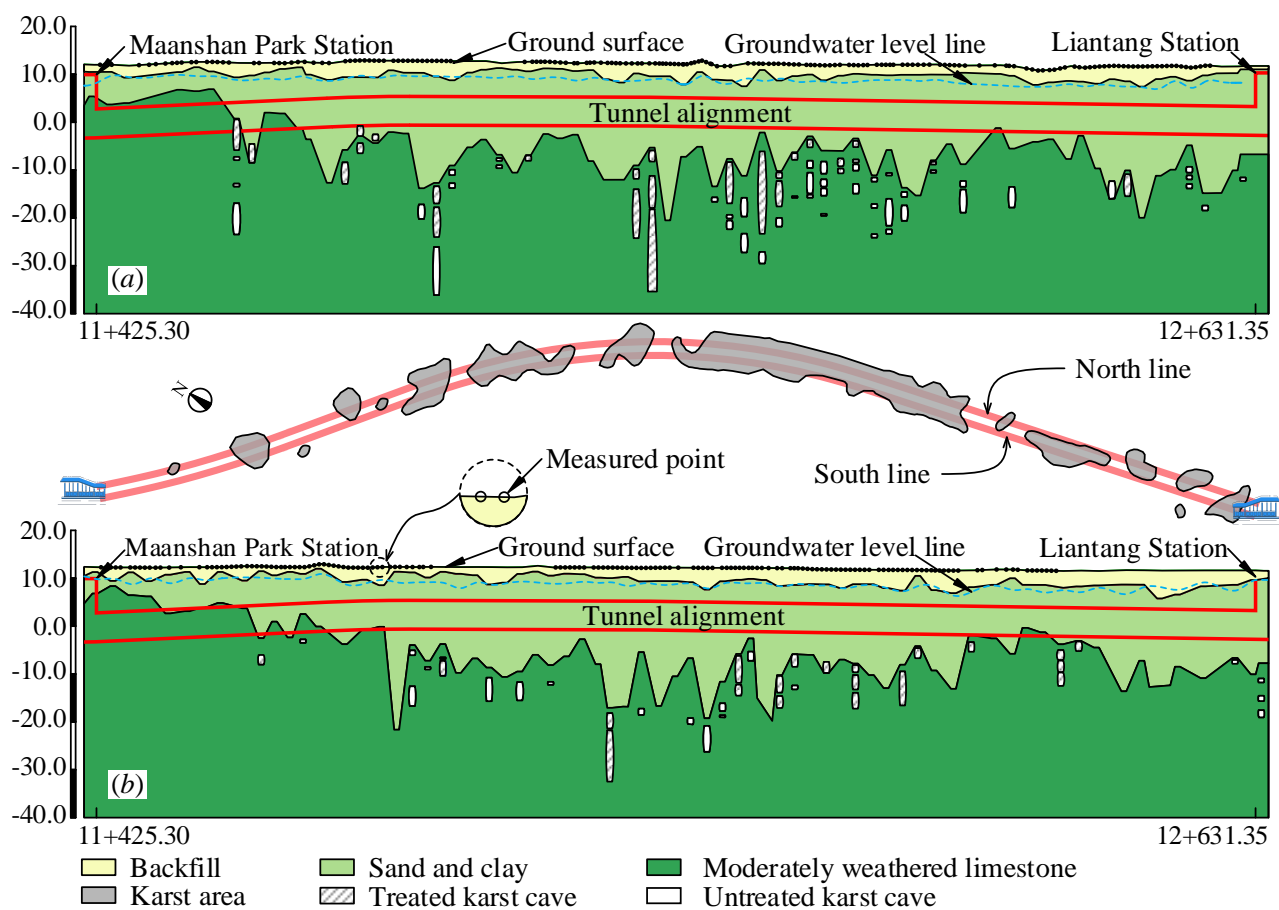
Geological profile at construction site: (a) north line tunnel section; (b) south line tunnel section.
